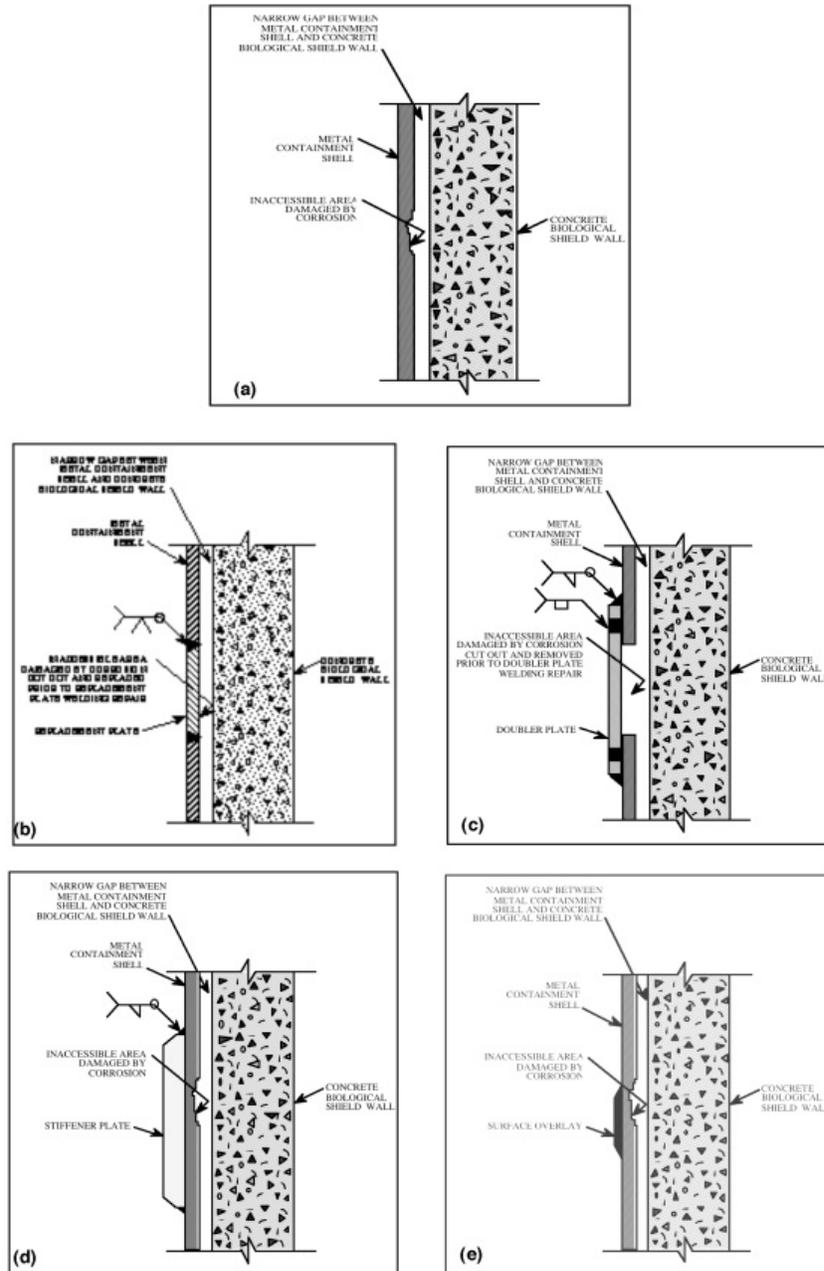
Examples of repair procedures for outside-initiated corrosion: (a) liner exhibiting excessive loss of section, (b) replacement plate welding procedure, (c) doubler-plate welding procedure, (d) stiffener plate welding procedure, and (e) surface overlay welding procedure (Oland and Naus, 1998).
